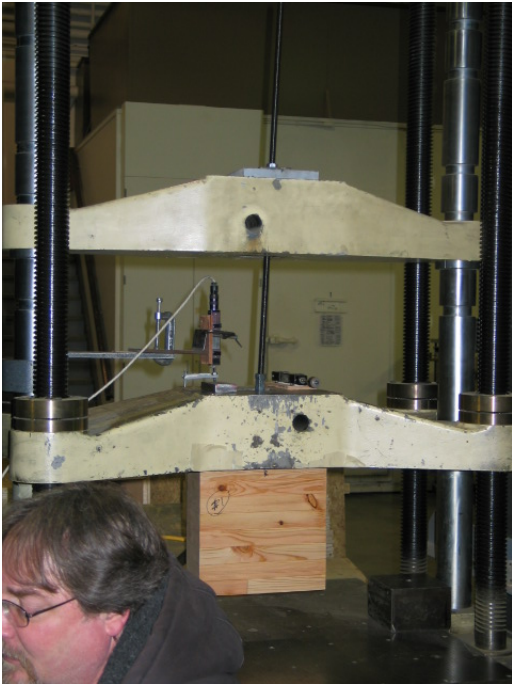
Overall test setup, threaded rod extends through square hole in bottom load head.
